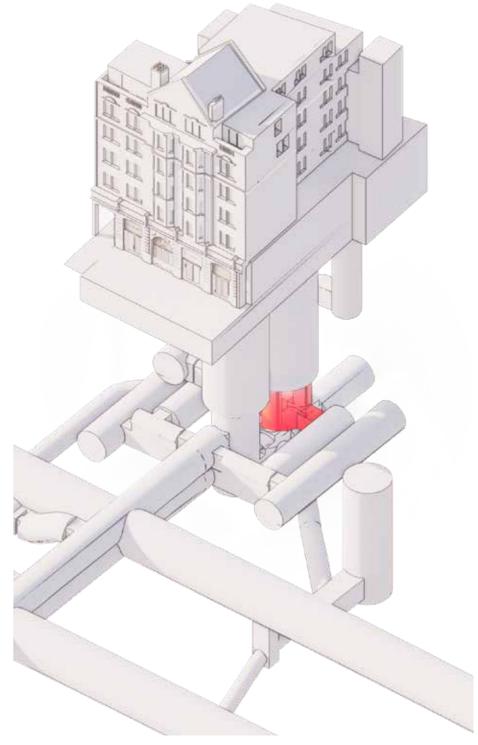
31-33 High Holborn: Proposed Shaft extension
